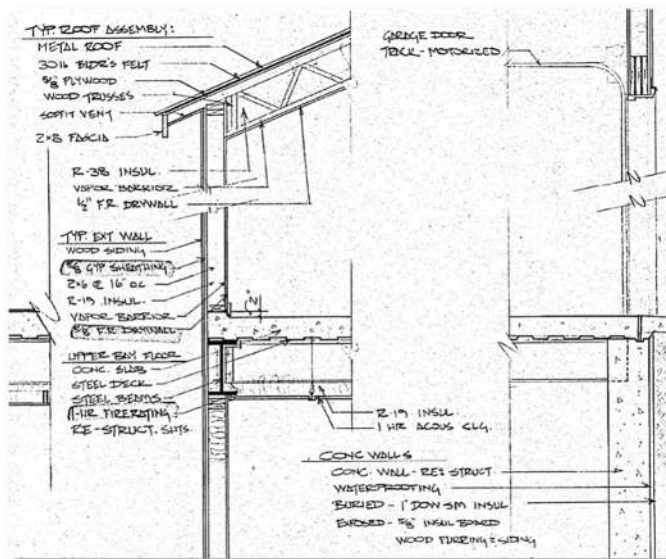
Wall Section 2 on Sheet A6, from 1982 Drawing Set, for the Town Hall Maintenance Facility.
